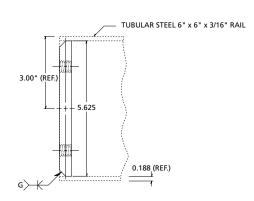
" x 6" STEEL RAIL PLUG PLAN VIEW
